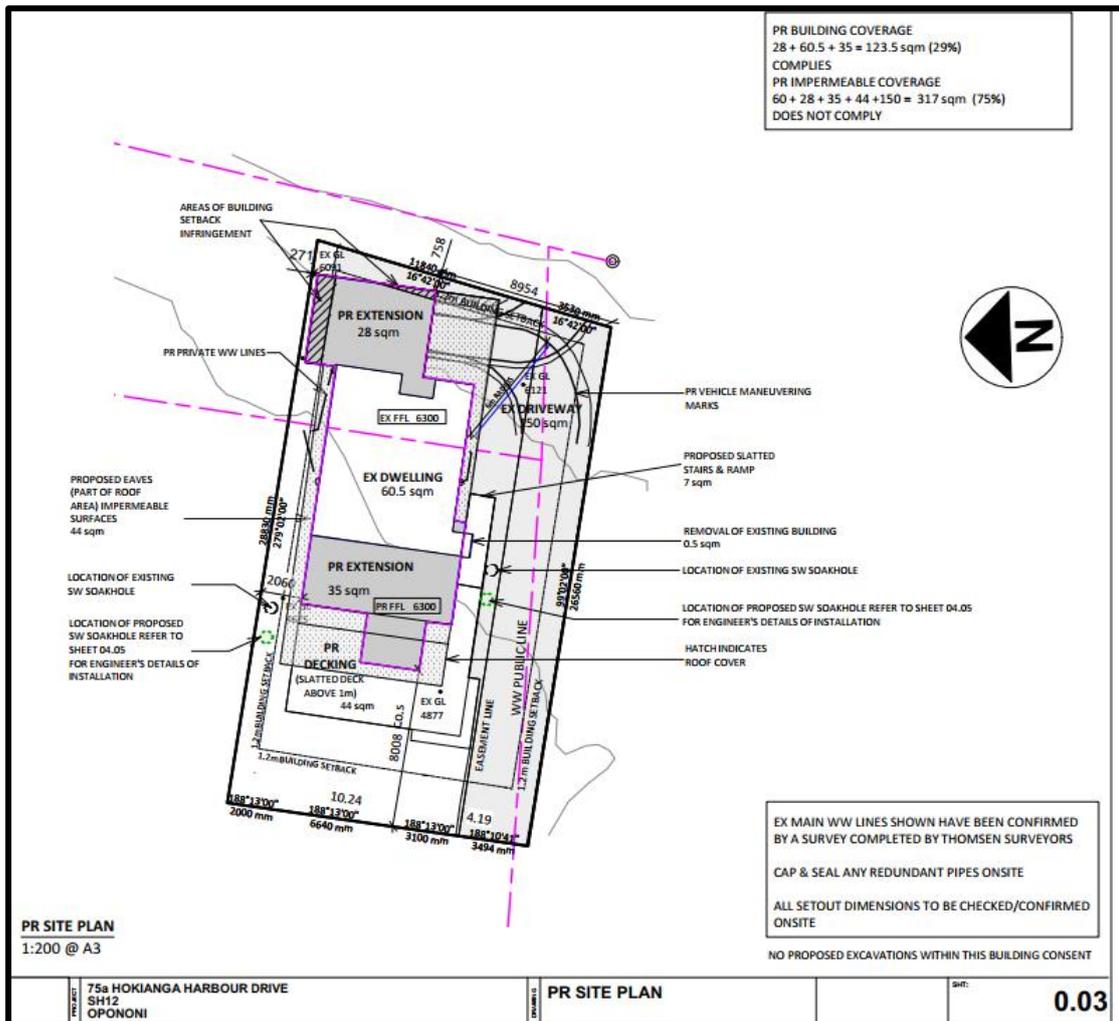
Proposed Site Plan. Source: Mealings Architecture Plan Set
